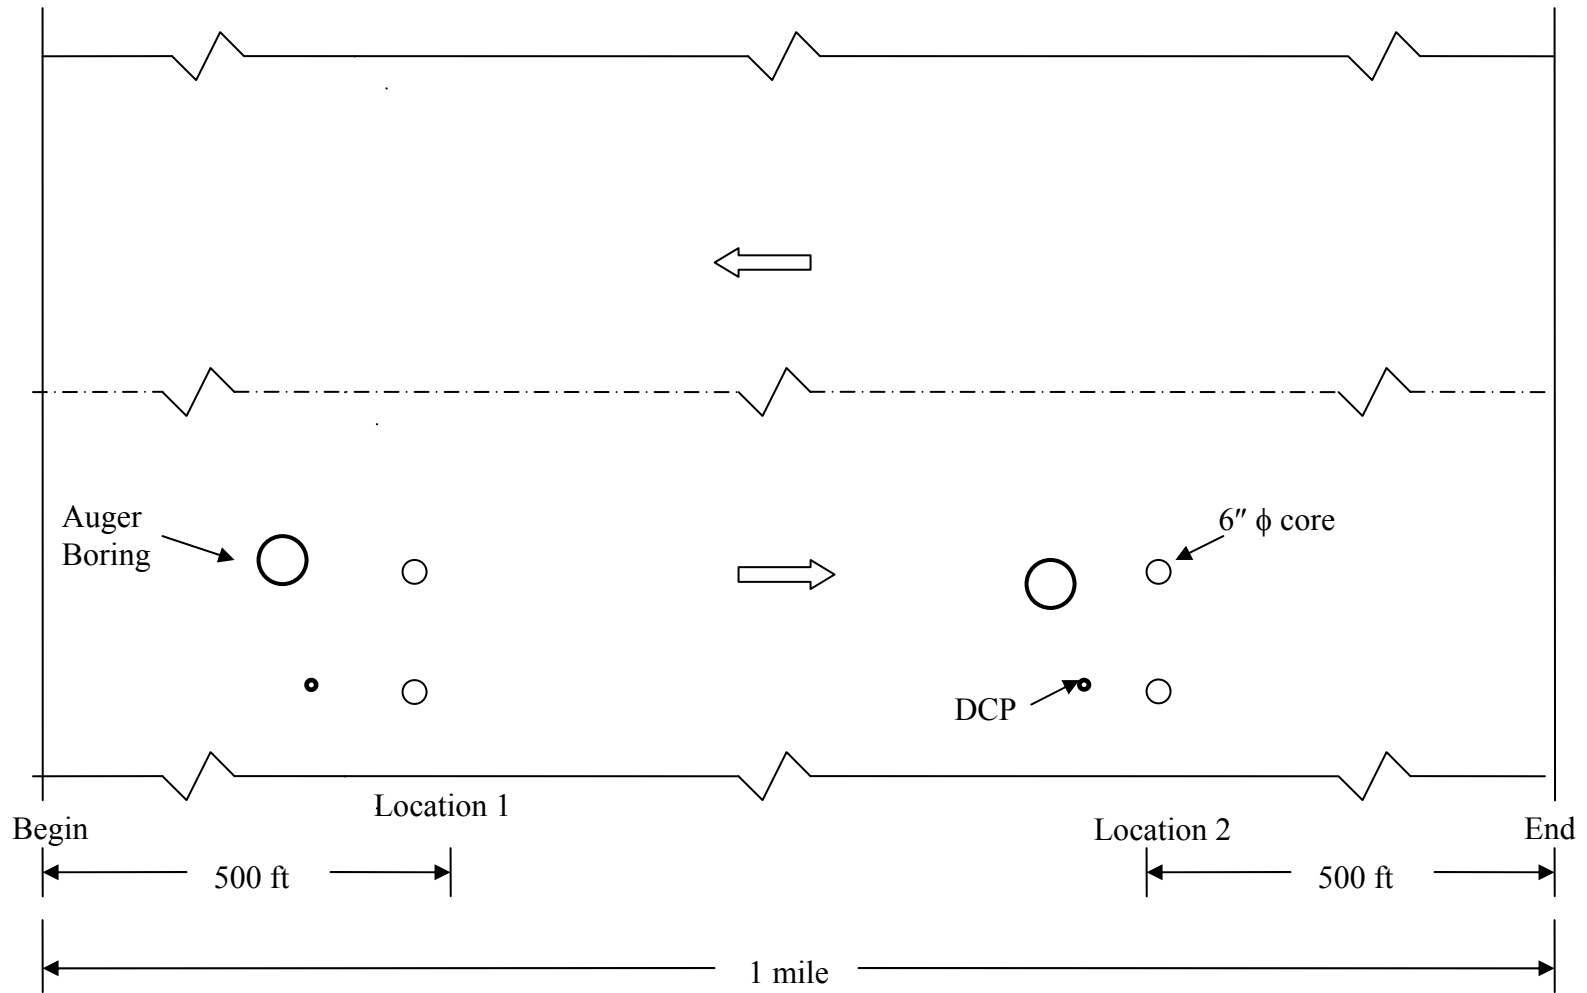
Typical Sampling Layout – Pavements with No Asphalt Concrete Mixture Layer(s).
